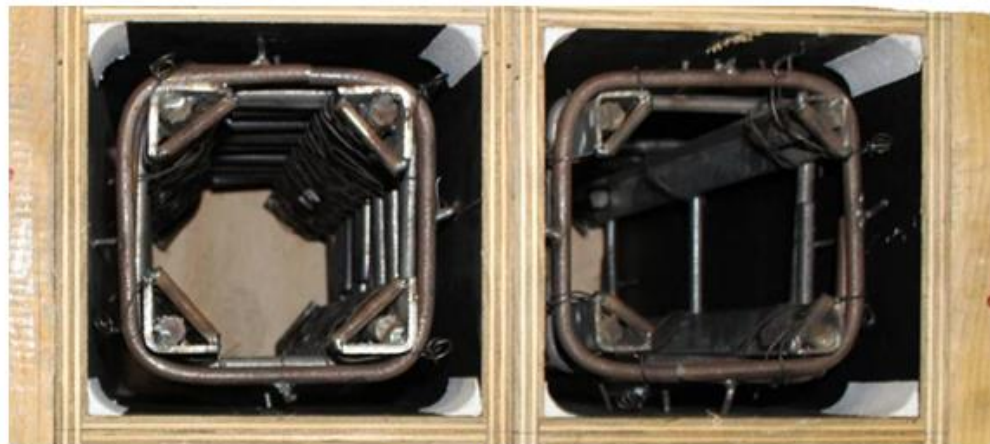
Plan view of wooden formwork for specimens with 600 mm height
